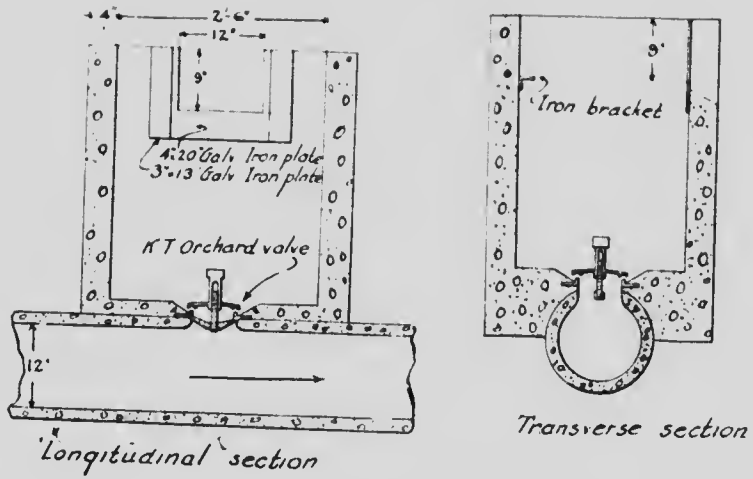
Typical weir box for valve take out from pressure pipe line.
